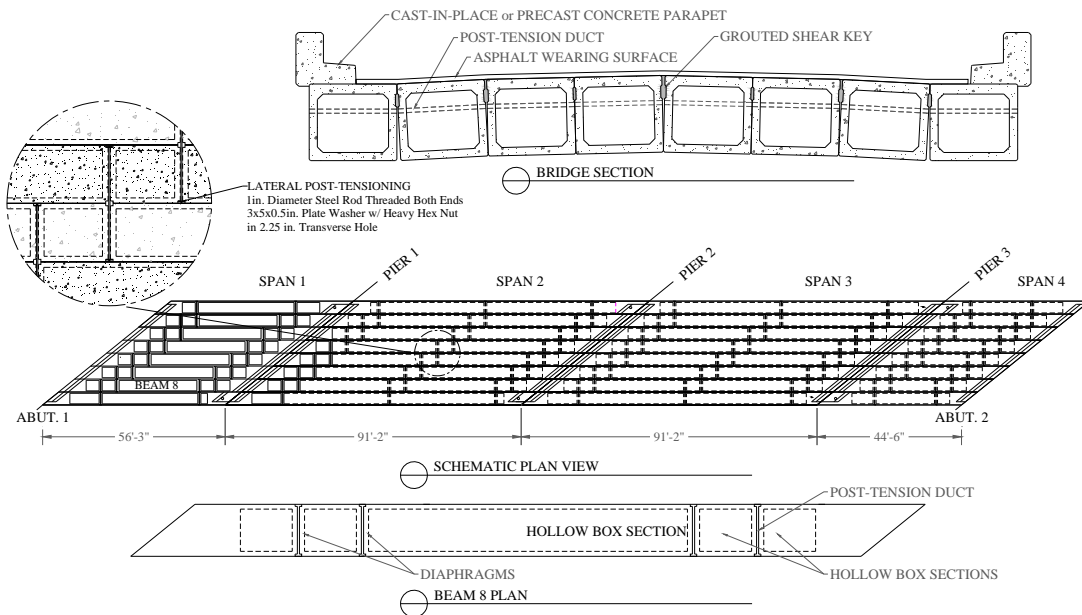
Typical non-composite adjacent prestressed concrete box girder bridge details
